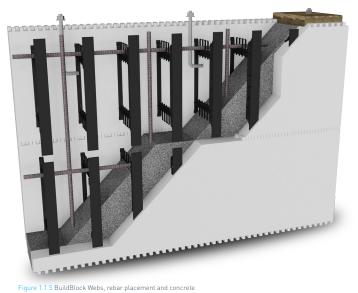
BuildBlock ICF wall section cutaway shows horizontal and vertical steel placement, alternating rebar placement to hold vertical rebar, J-bolts mounted in the concrete and a wooden top plate.
